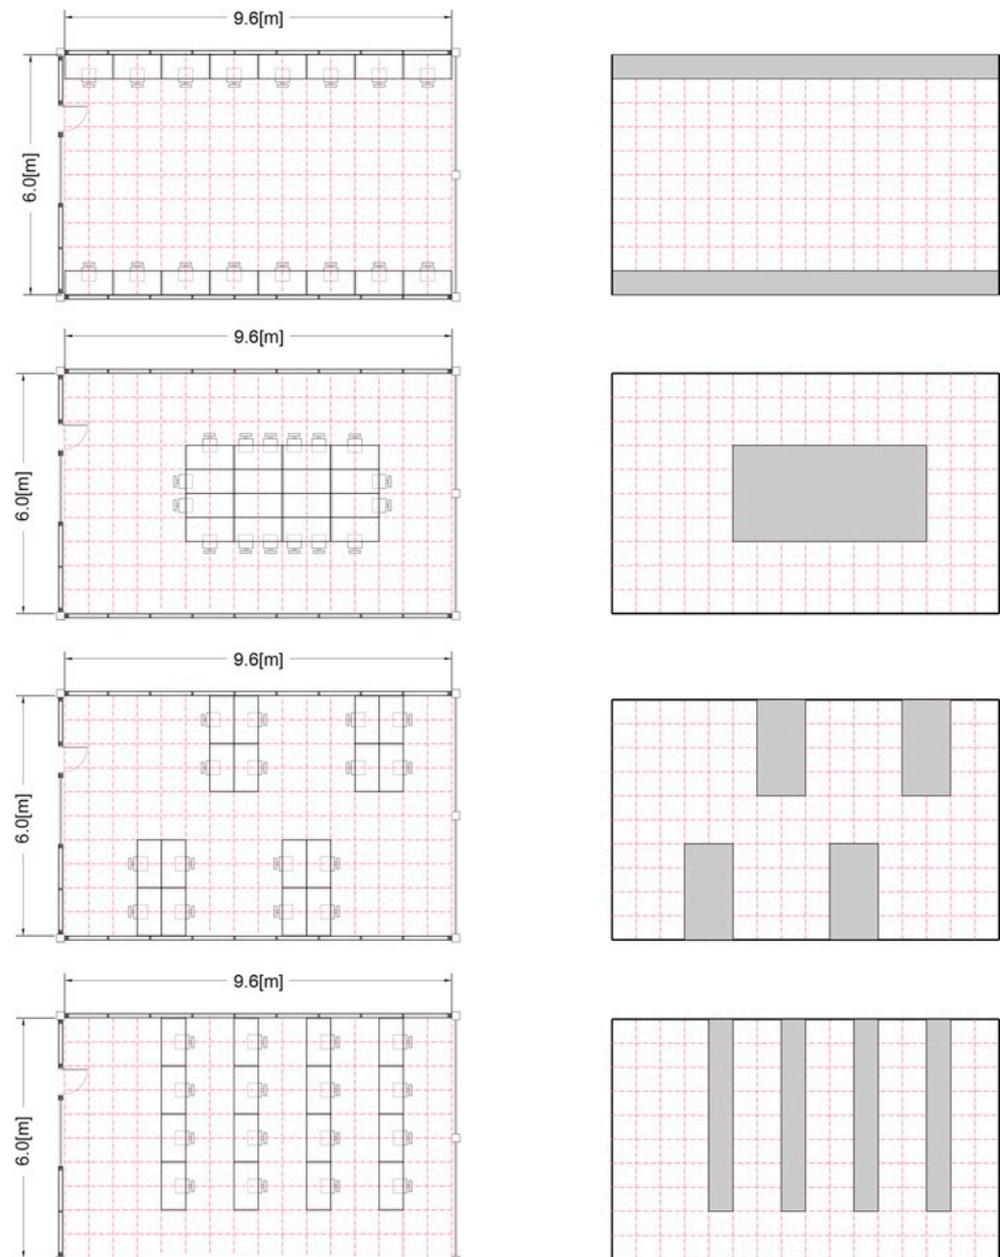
Floor plan and schematic representation of a typical classroom with four different furniture layouts.
